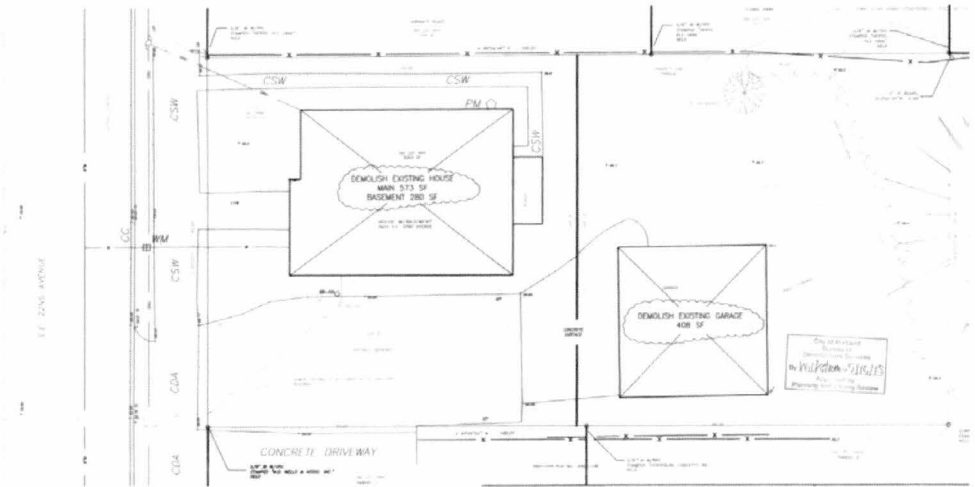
Site plan of address 5624 SE 22nd existing buildings to be removed.
